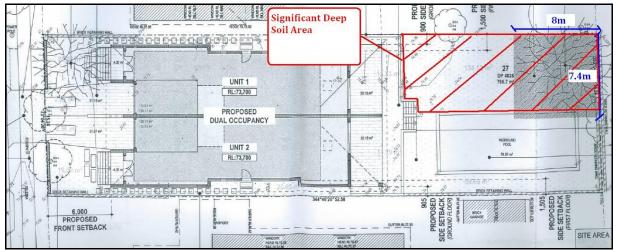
Plan of proposed development and landscaping on subject site. Diagram shows the significant amount of deep soil area provided in the rear yard, despite not meeting the minimum 8m x 8m dimension outlined in the Ryde DCP 2010.
